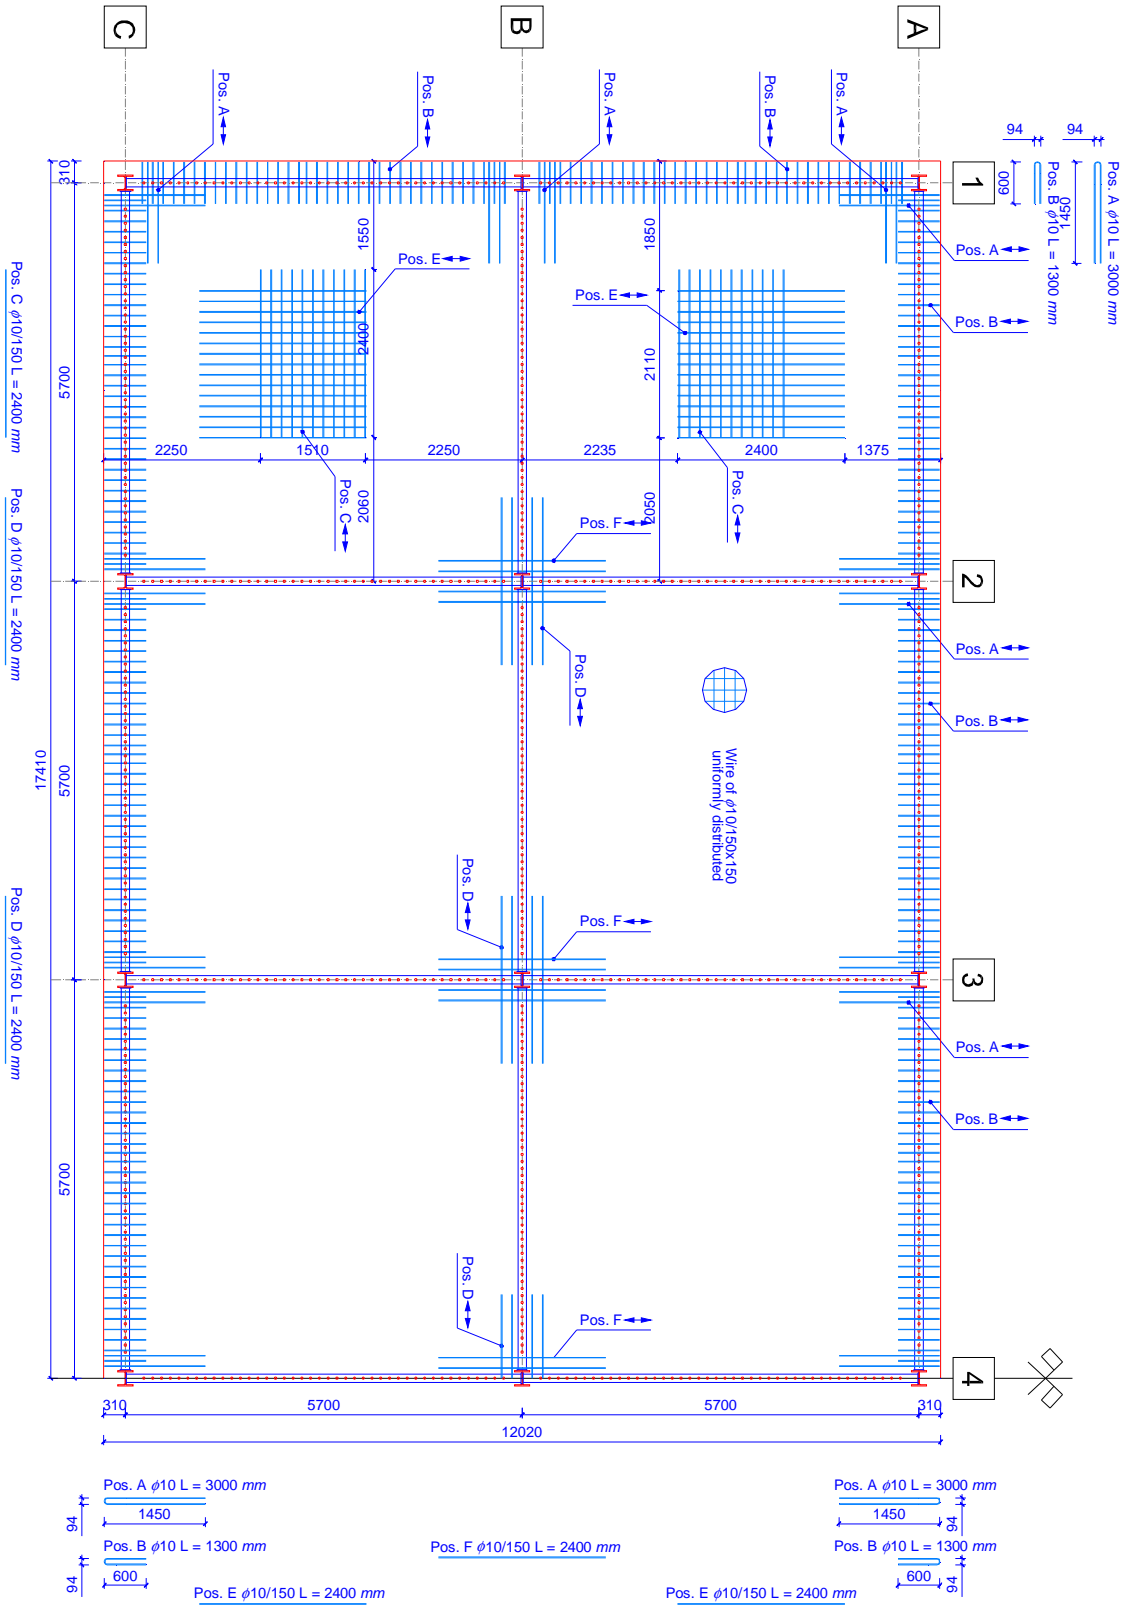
Slab Rebars - Lower Side – Symmetric Configuration (length unit mm)
